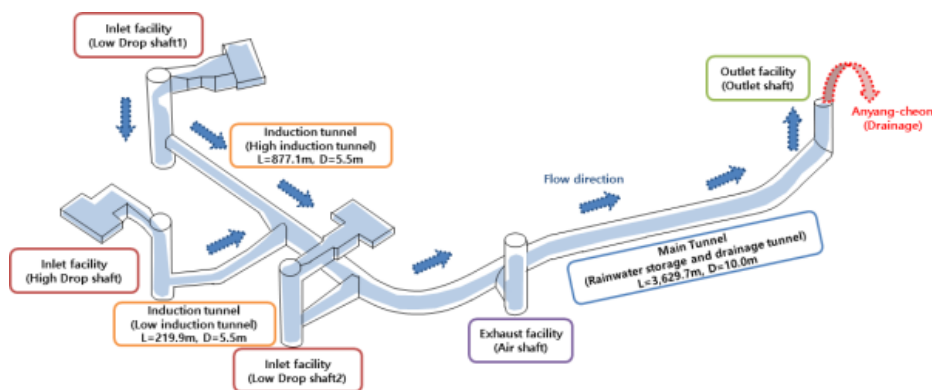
Concept of Shinwol rainwater storage and drainage system (Hyundai Construction & Engineering)
